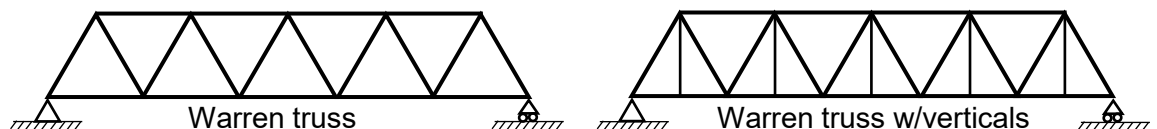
Common types of Truss Bridges ⁽¹¹⁾
